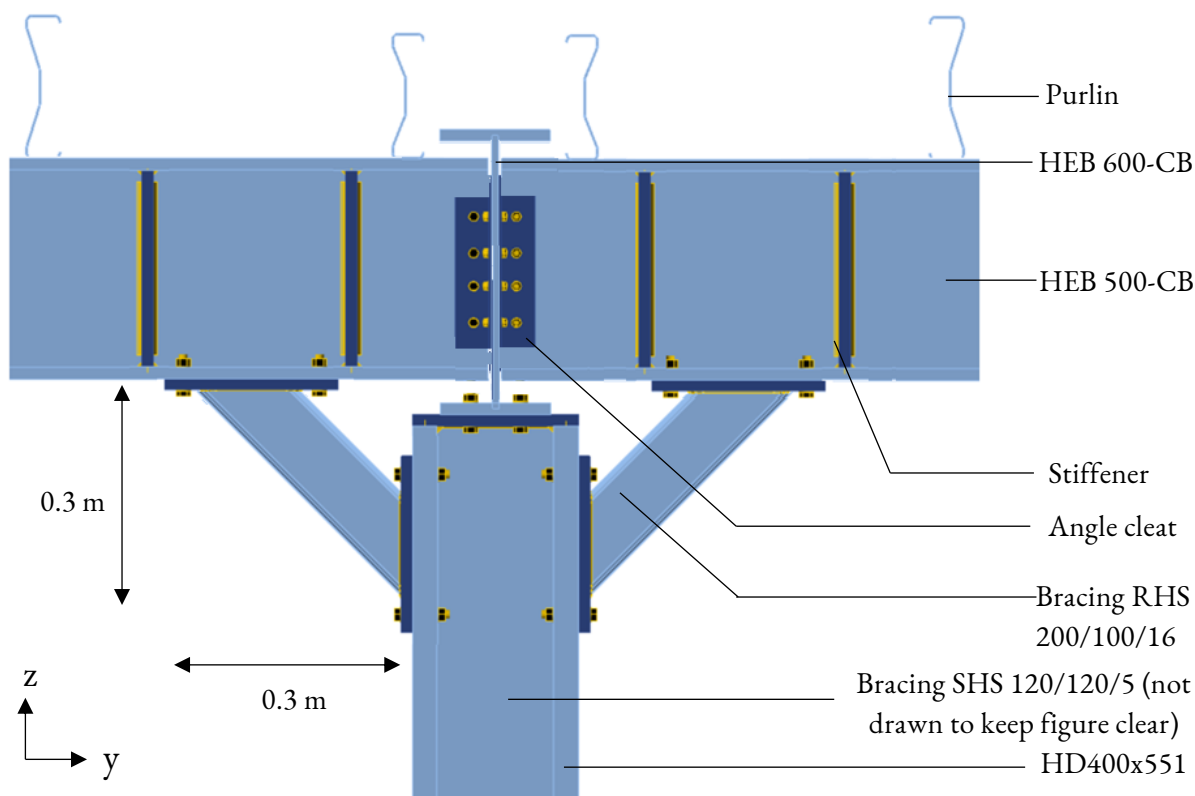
Connection between beams and column (own illustration, made with IDEA StatiCa)
